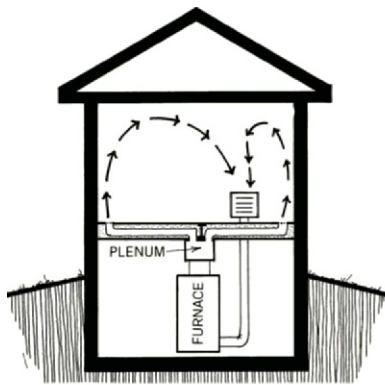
The extended-plenum system for basement construction has the supply ducts run parallel and between joists to save on headroom.
